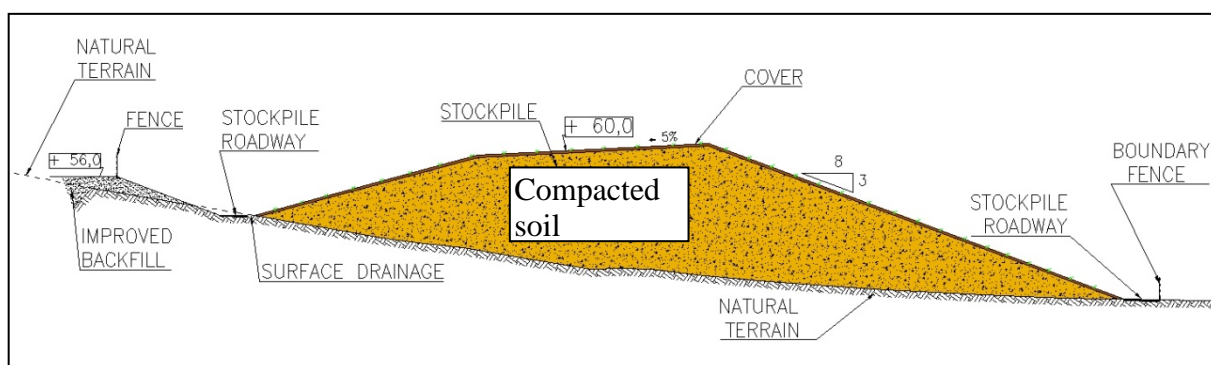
DESIGN OF THE LANDFILL FOR EARTH MASSES – CROSS SECTION
